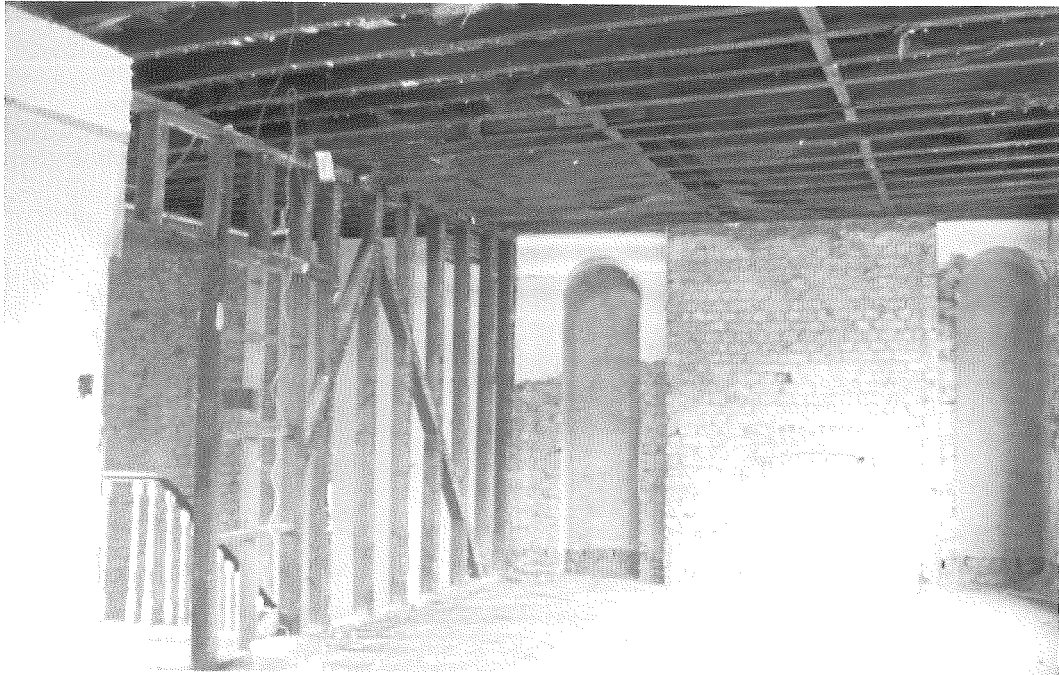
Interior, second floor, looking towards staircase (southeast)
